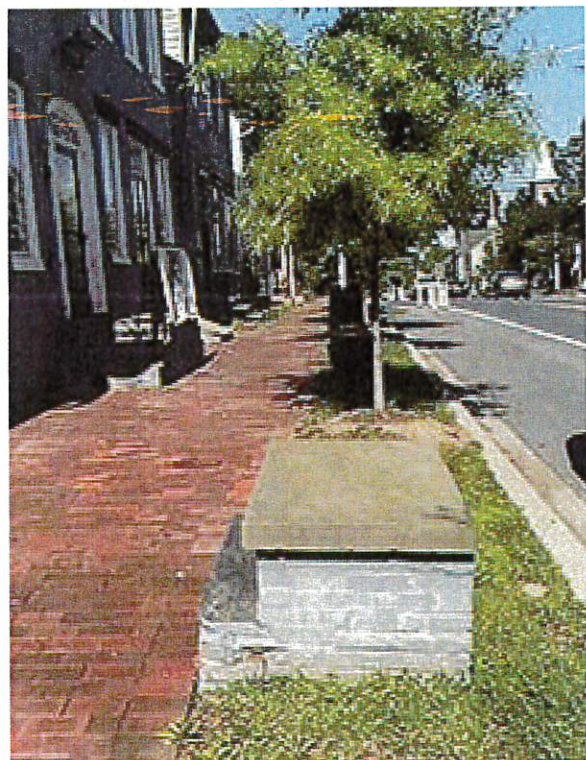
The sidewalks on Main Street brick with running bond brick pattern and a soldier course header.
